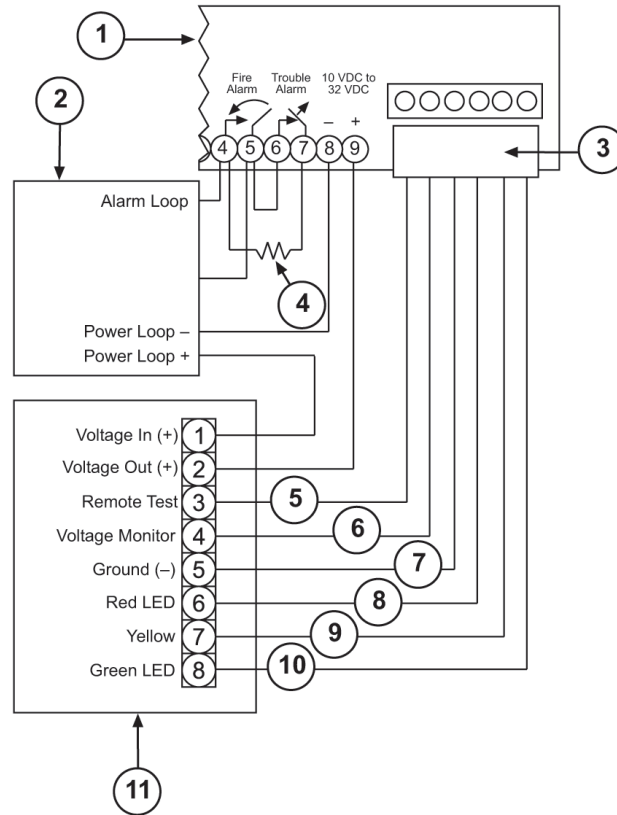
Connecting a D344-RT Remote Test and Indicator Plate
